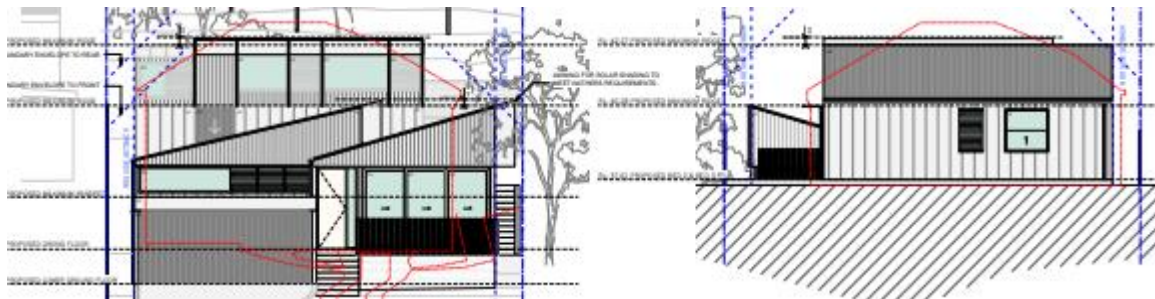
Eastern (front) and Western (rear) elevation of principal dwelling (source - Adriano Pupilli Architects)
